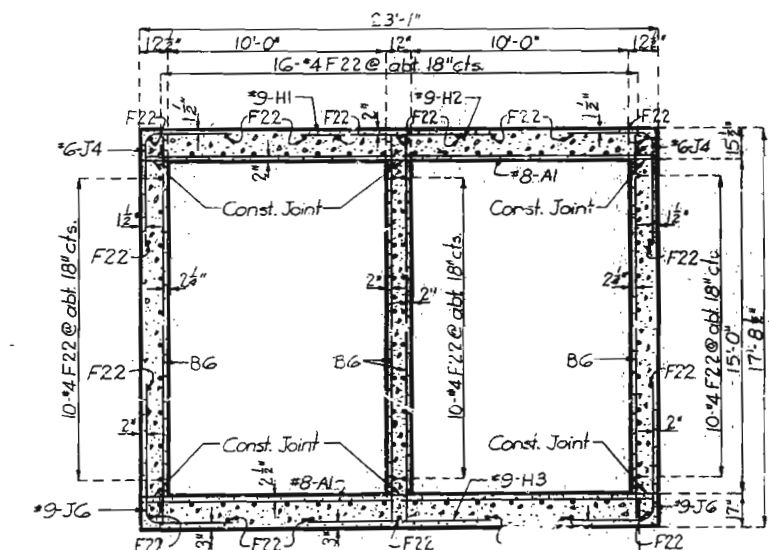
DETAILS OF SECTIONS ② ③ ④ & ⑤
